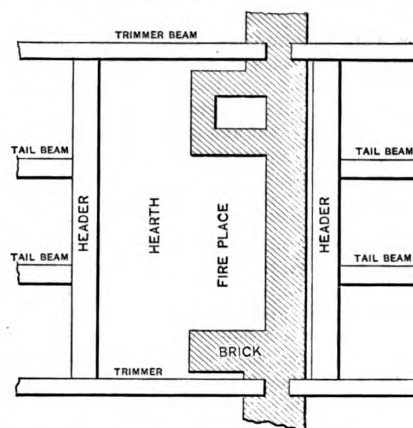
Plan View of Hearth and Fire Place Showing Headers, Trimmers and Tail Beams.
